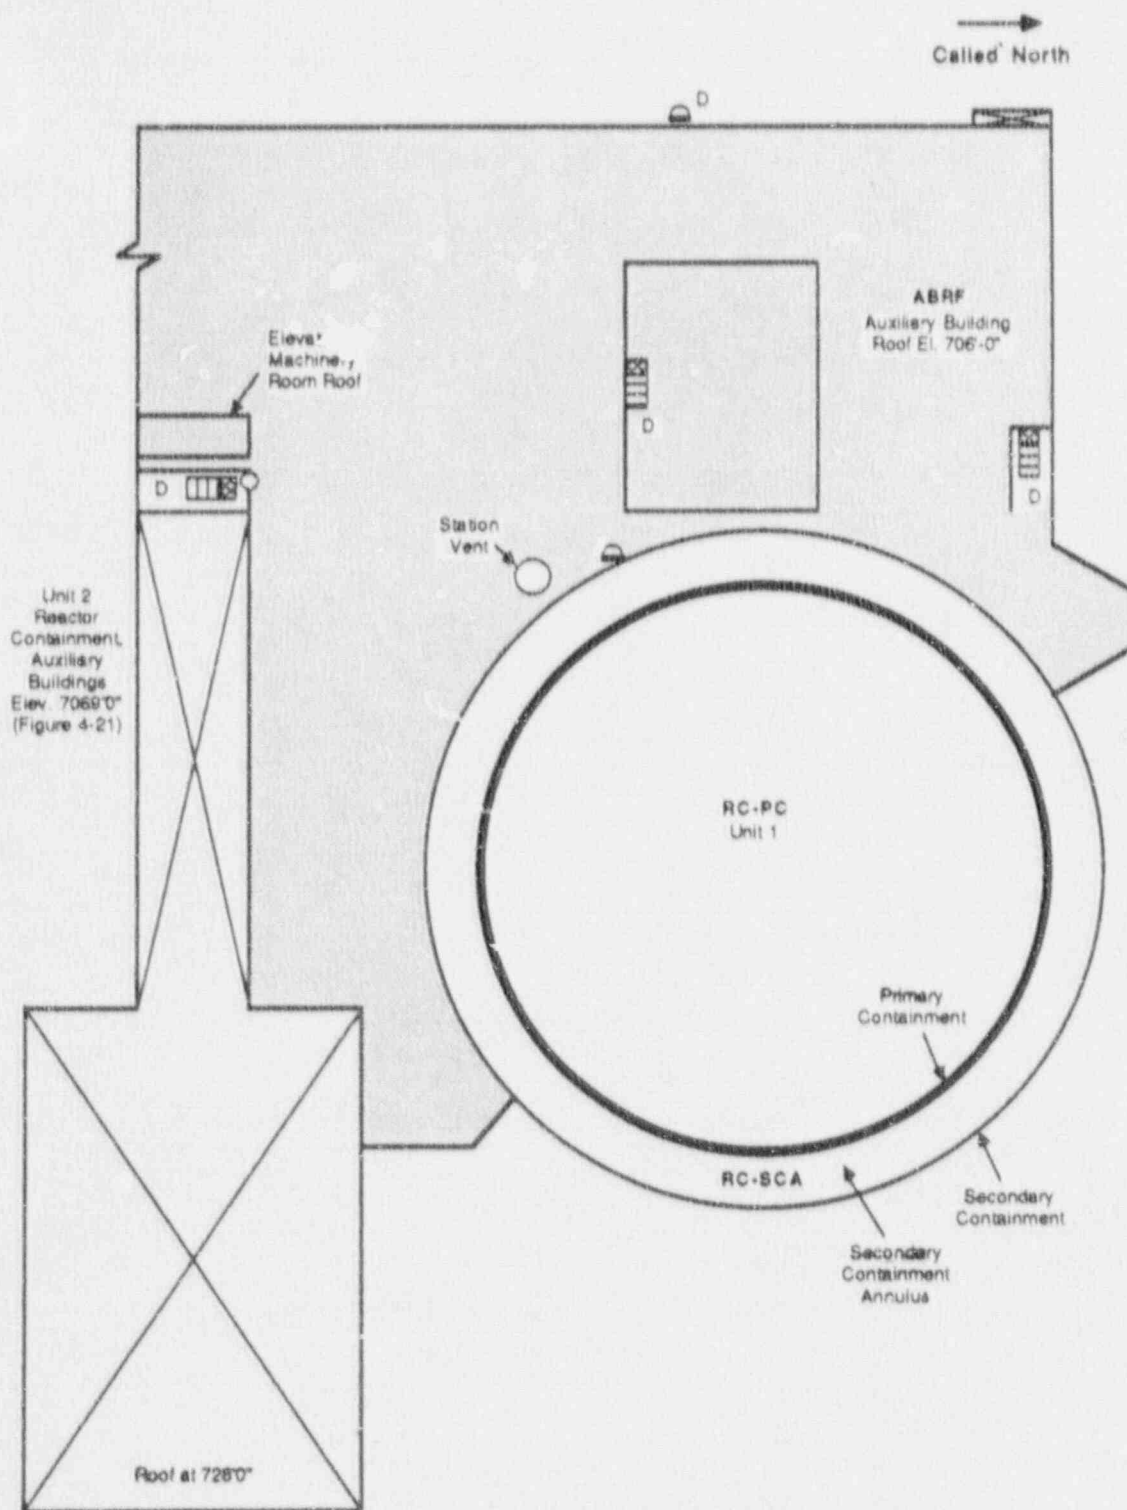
Bellefonte 1 Reactor Containment and Auxiliary Buildings, Elevation 706'-0"
